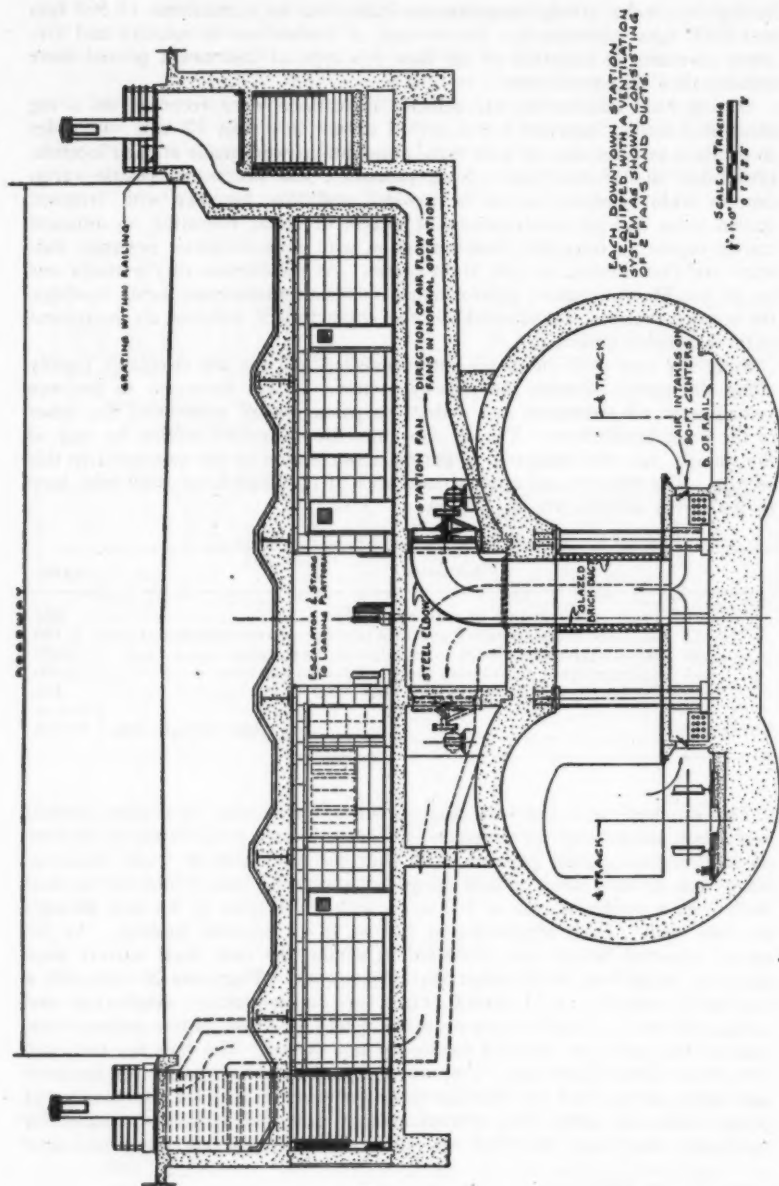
TYPICAL VENTILATION SYSTEM FOR DOWNTOWN STATIONS
